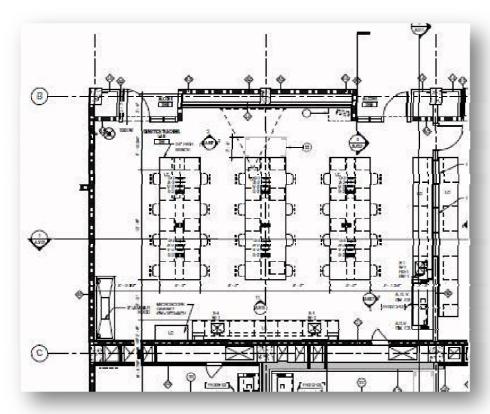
GENETICS TEACHING LAB FLOOR PLAN
